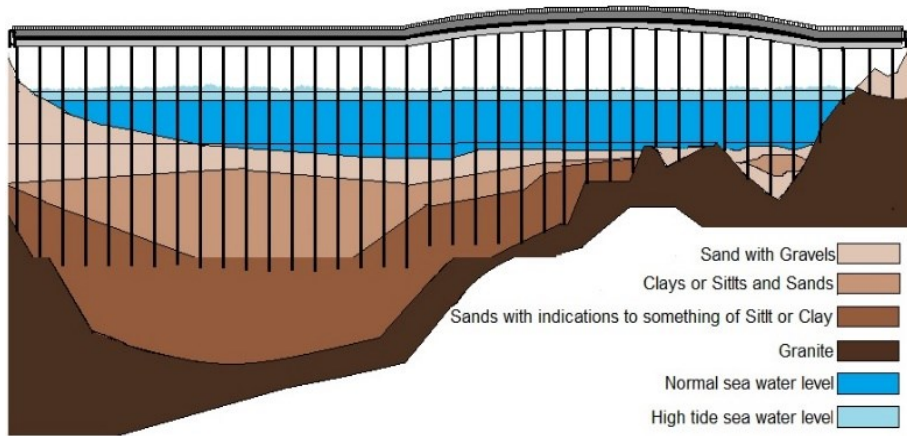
The total view of the piers and deck of Spain's reinforced concrete coastal Arosa bridge.
